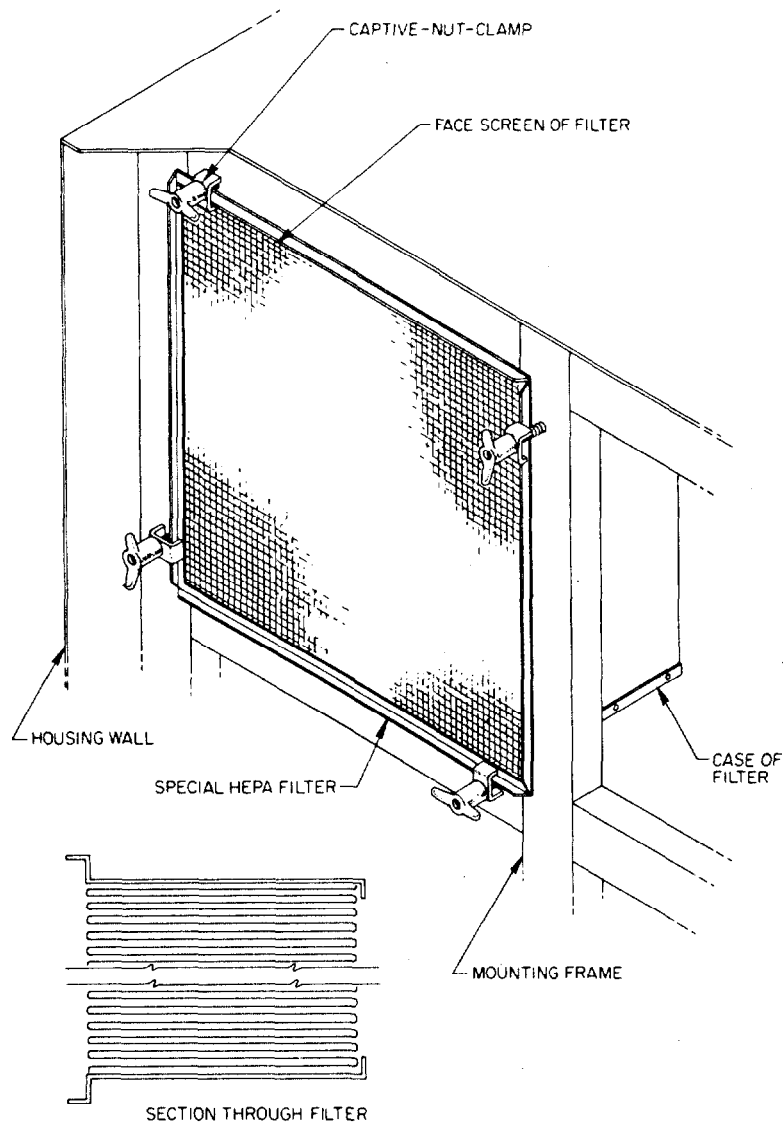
Section of drawer-type mounting frame for HEPA filter showing details of clamping and specially designed HEPA filter. Courtesy Flanders Filter Corp.
